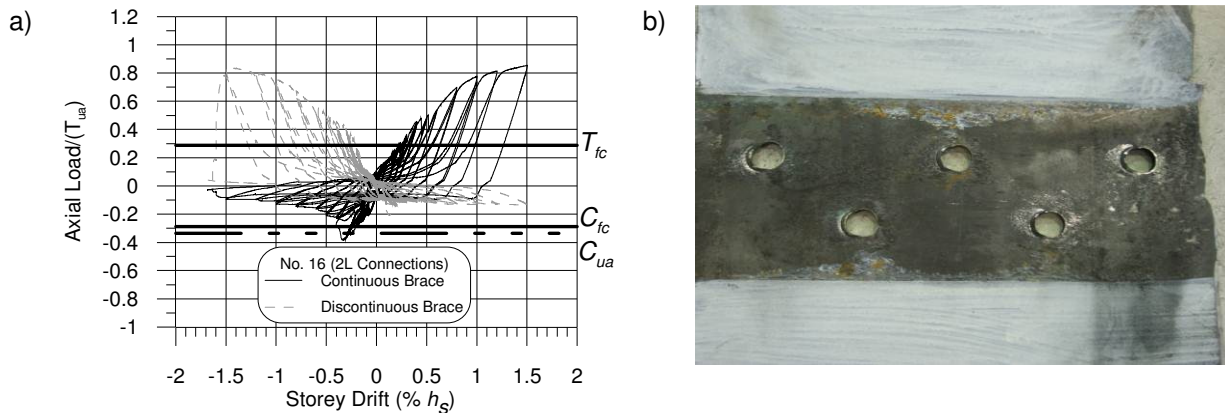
2L X-bracing (Specimen no. 16): a) Hysteresis; b) Bearing at bolt holes.
